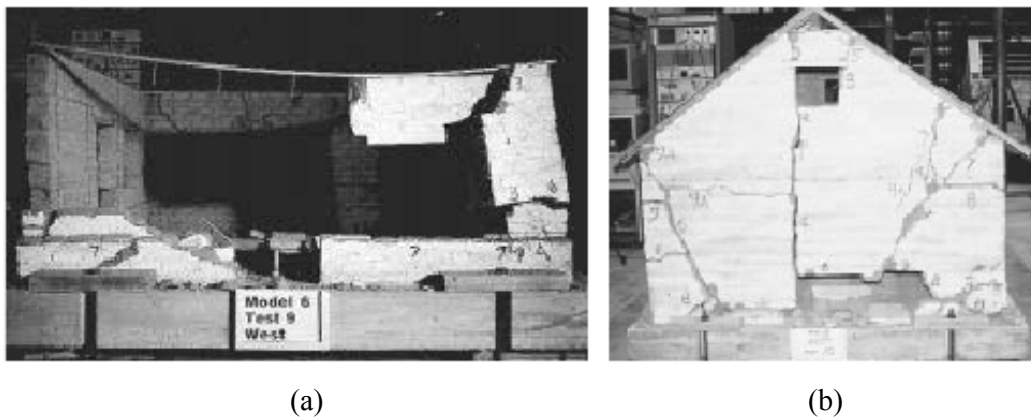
West wall of Model house 6 (a) after test level VIII and west wall of model house 8 (b) after test level X (Leroy Tolles et al 2000).
